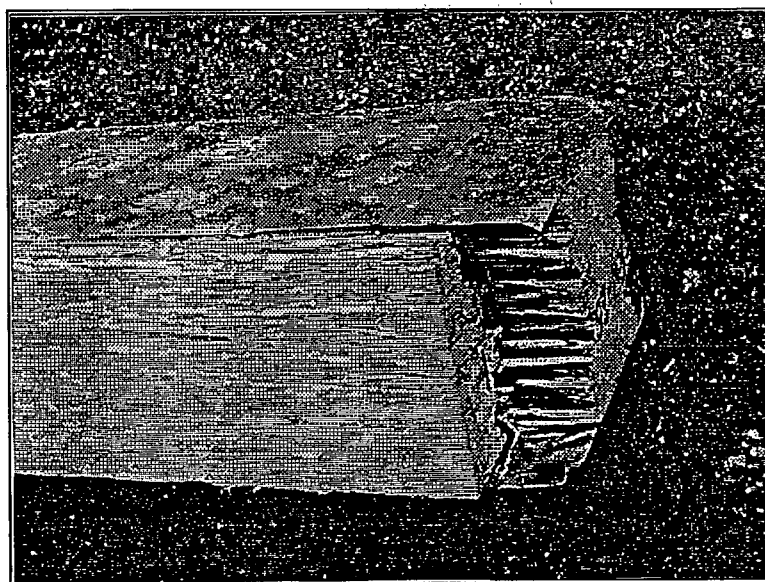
Shear plug failure of 5/8"18 gauge nailed plate (finishing nails) reinforced PSL specimen.
